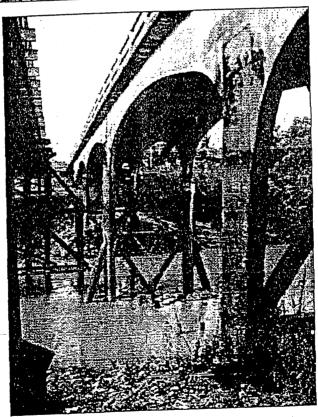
Preak Ho Bridge on NR2 was constructed in 1922. Several Piers have been suffered due to ageing and heavy loaded truck
